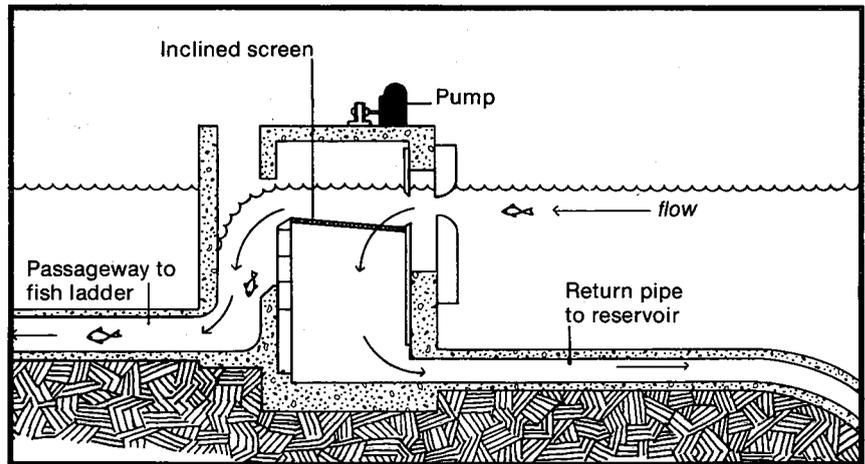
Sectional view of skimmer used to bypass smolts at Pelton Dam, Oregon.
